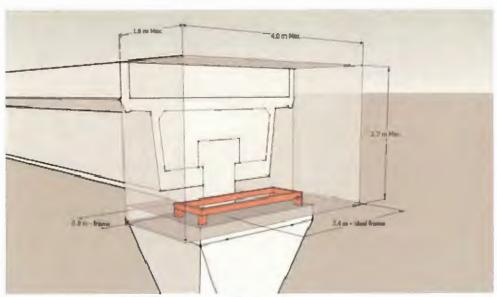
Art plinth structural frame and overall space allowances and dimensions for artwork.
